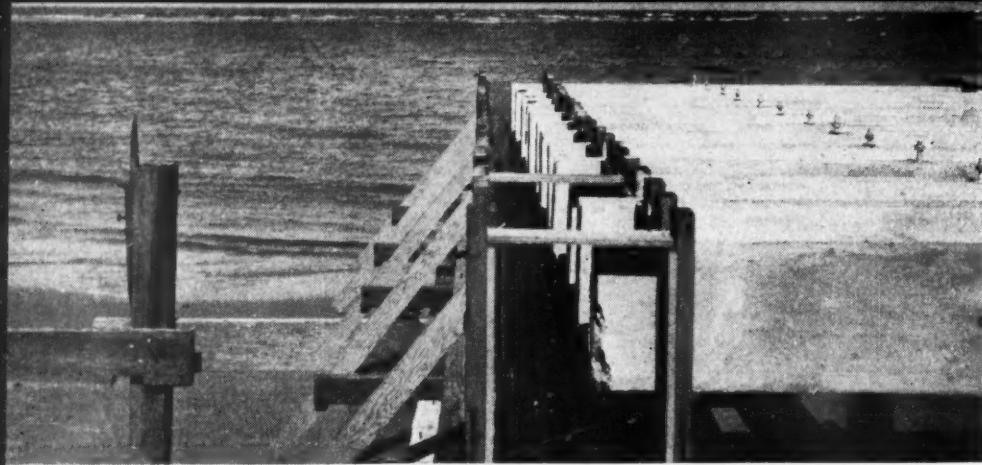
DETAILS OF SUBSTRUCTURE show how various units are tied together to resist uplift of storm waves. This design of precast piles and stringers framing into poured-in-place caps made construction simple.
